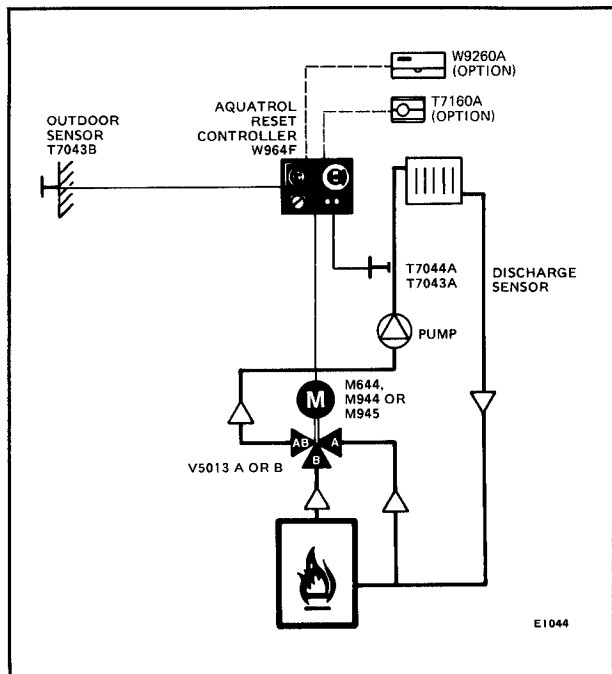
HOOKUP FOR W964F IN TYPICAL 3-WAY MIXING VALVE SYSTEM.
